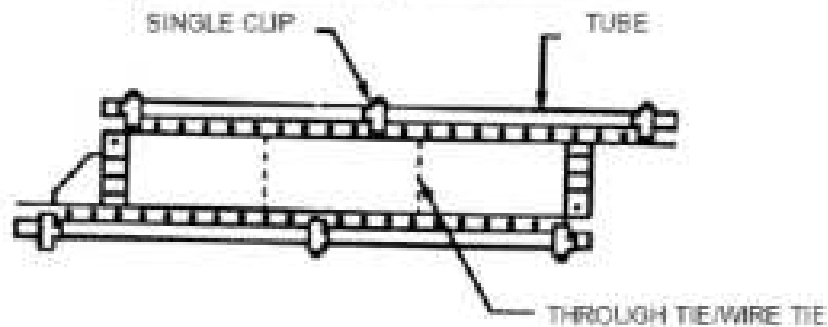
C : Column Form with Adjustable Shuttering Wall Form Type Panels
